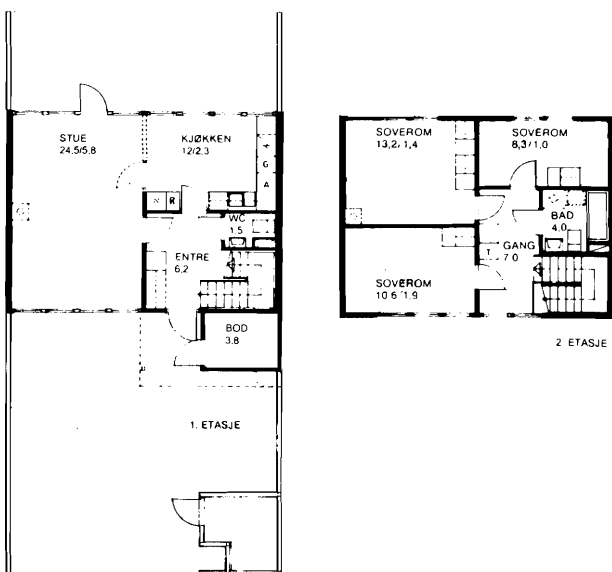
Floor plan of 4-roomed row houses, 99,0 m² living area, Type 4C
